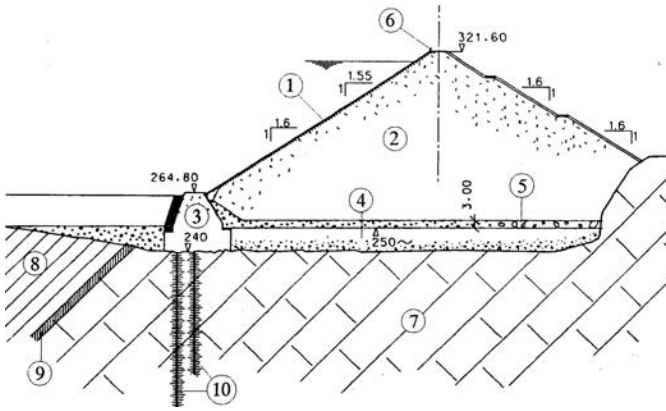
Bovilla dam, cross-section (after CARPI 1996). (1) Geosynthetic waterproofing system; (2) rockfill; (3) concrete block; (4) river deposit; (5) drainage layer; (6) crest wall; (7) karstified limestone (8) schist; (9) fault; (10) grout curtain.
